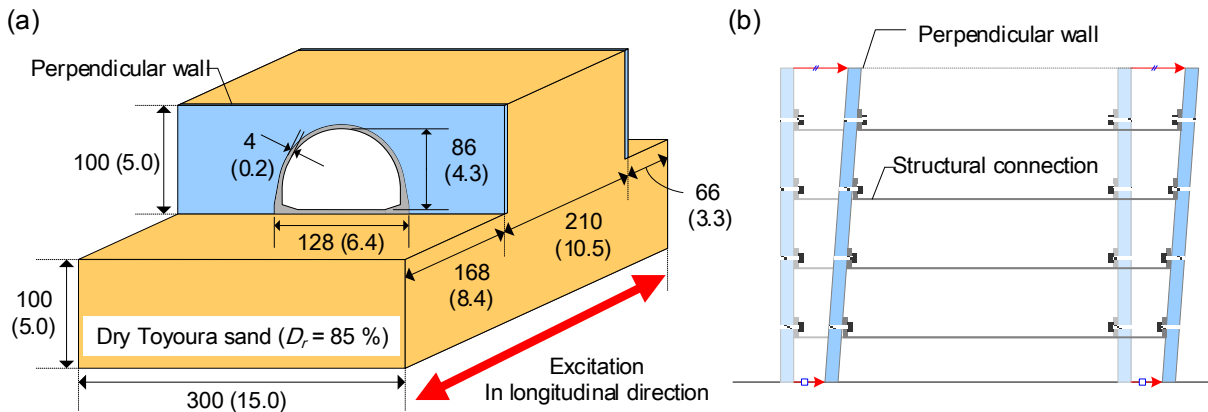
Schematic drawing of shaking table tests on three-hinged arch culvert with mouth wall of reinforcing earth wall (Toyota and Takagai, 1999; Toyota and Ito, 2000).
